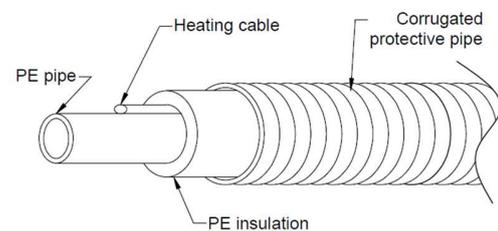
PE pipe with heating cable in insulation and corrugated protective pipe
